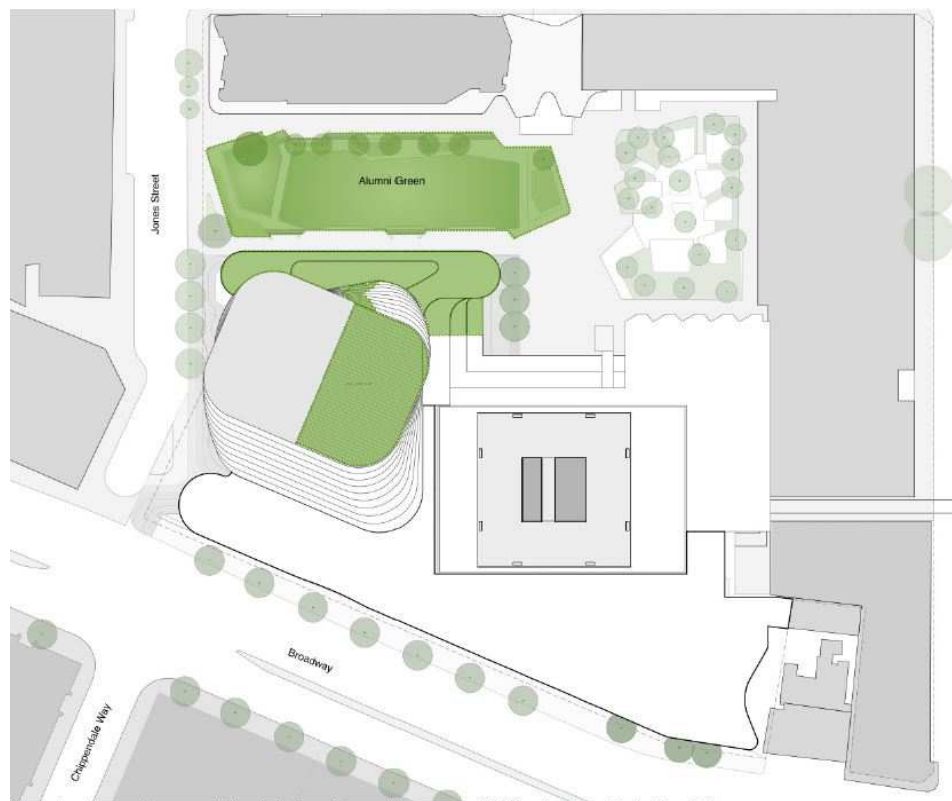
Roof plan showing the connectivity of wintergardens and terraces to CB02 and relationship with Alumni Green
